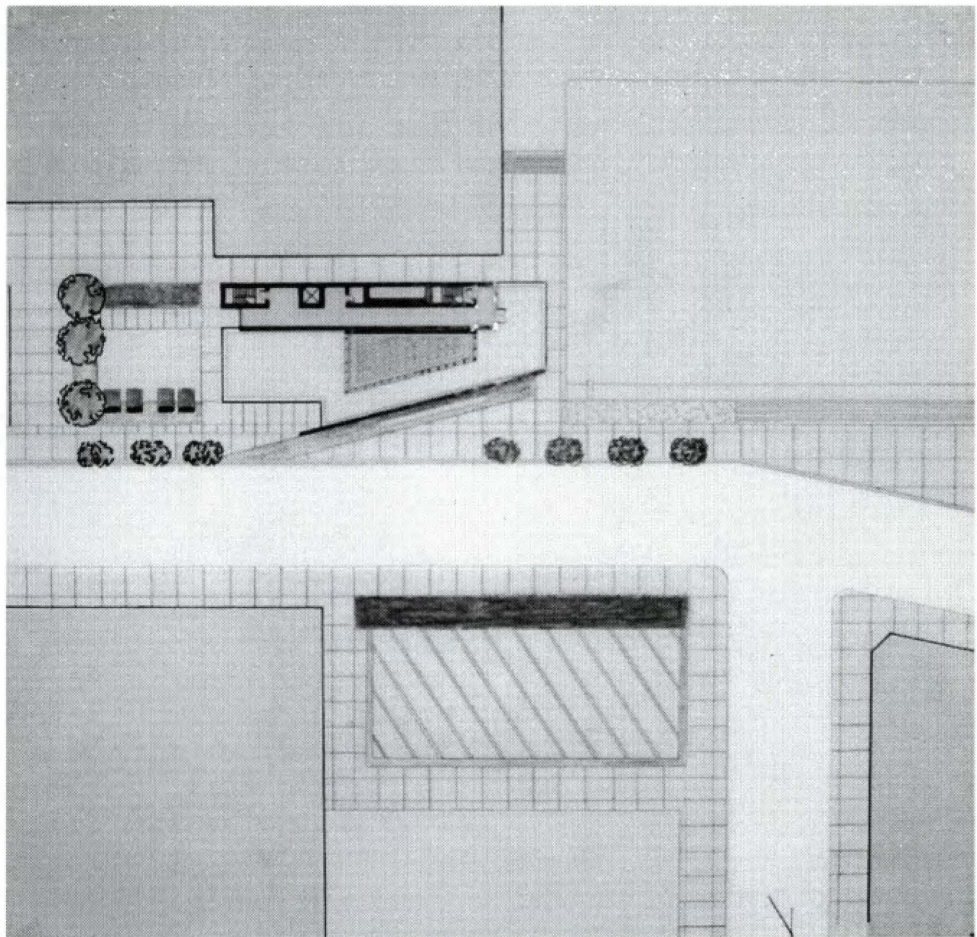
FLOOR PLAN - URBAN PLAZA OBSERVATION FLOOR
